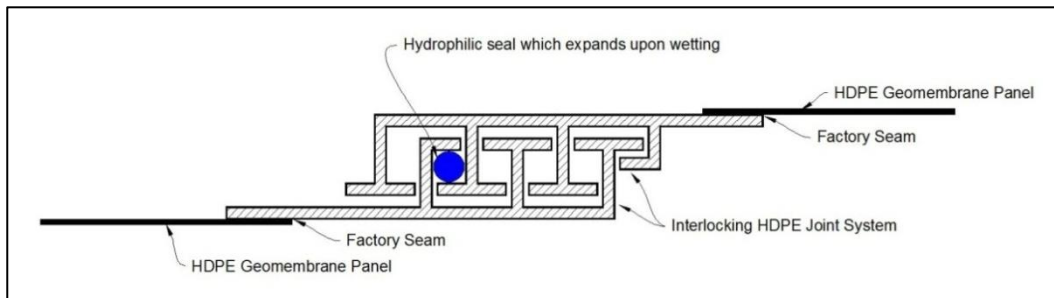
Typical schematic of GSE, Inc., curtain wall interlock joint used in geomembrane panel cutoff wall construction at Reach 11 Dikes, Arizona.
